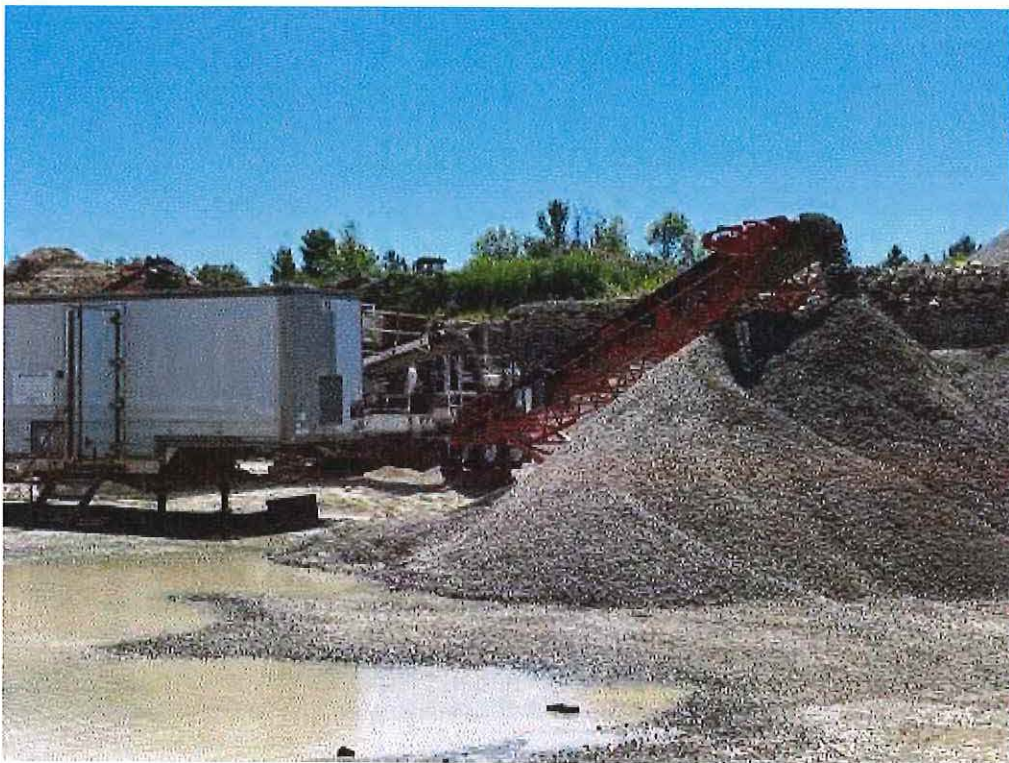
(Crushing Plant) : Iron City Enterprises crushing plant at the Wildwood Pit.
